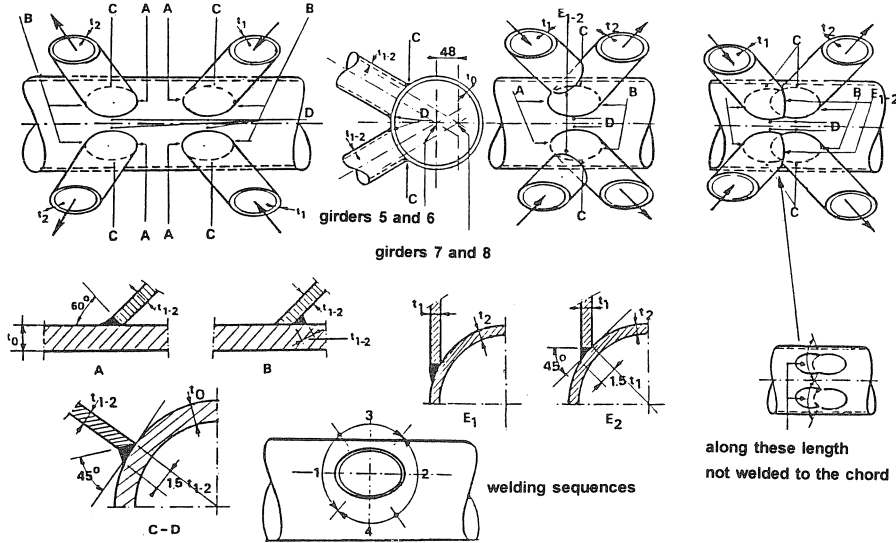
Welding details and welding sequences for the tested girders 5, 6, 7 and 8.
